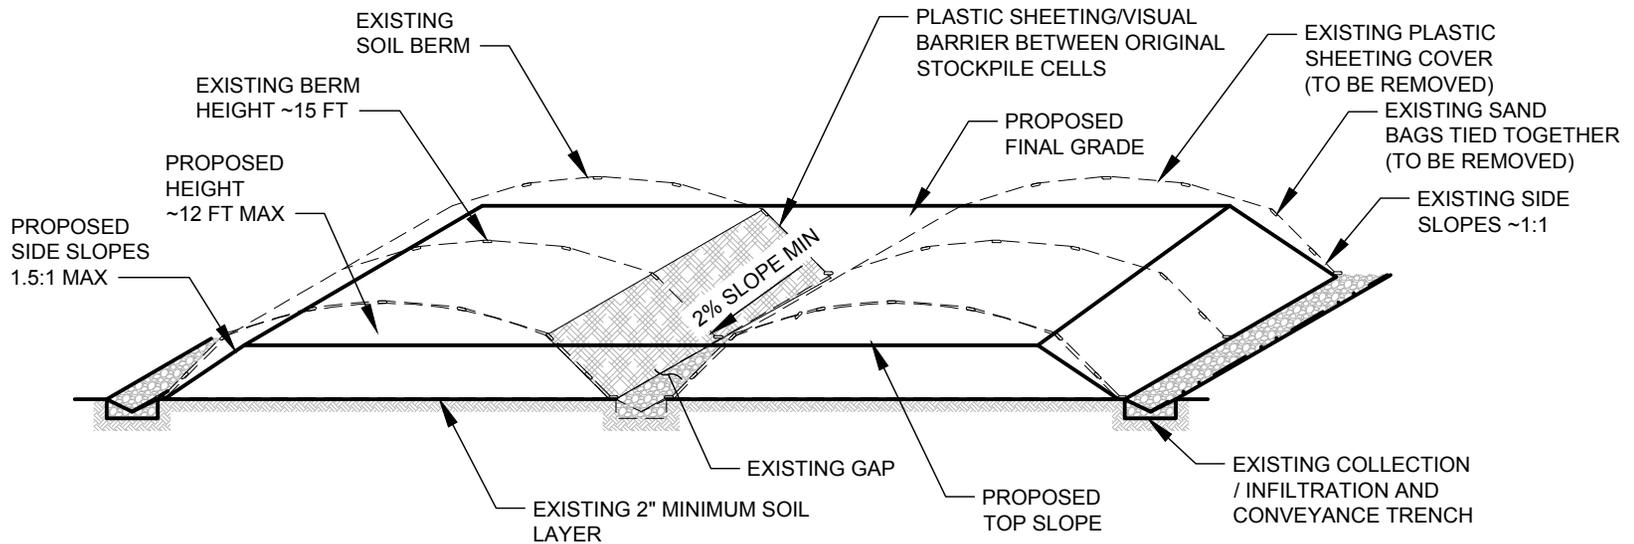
(attached) presents the conceptual long-term soil management plan. In general, the plan specifies that adjacent soil stockpiles will be combined and graded within existing soil bin footprints to remove the gap between piles, sloped to promote drainage, and hydroseeded with grass. Specifically, the following stockpiles will be combined and graded (Figure 3):
